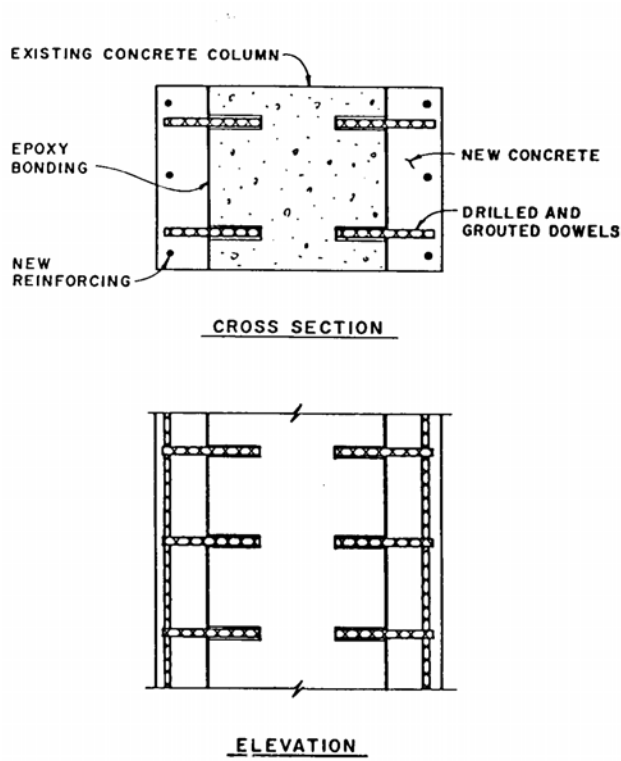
Reinforced Concrete Column Retrofit-4
